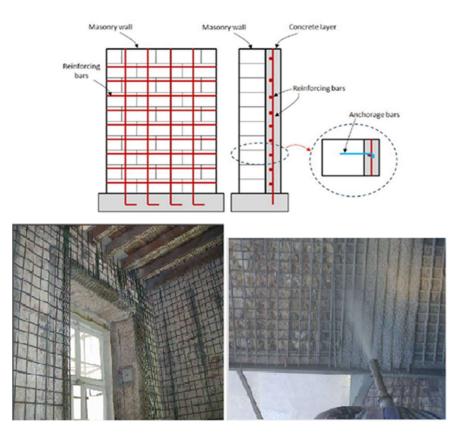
Typical detail of masonry wall strengthening with reinforced concrete layer (Ghiassi et al., 2011; Meireles et al., 2013)
